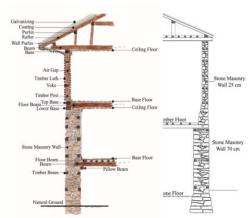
Cross section of Kahramanmaraş houses; 'picture in left'; timber frame walls rested on stone masonry, 'picture in right'; two floor height of stone masonry and its thicknesses with unique knitting technique.
